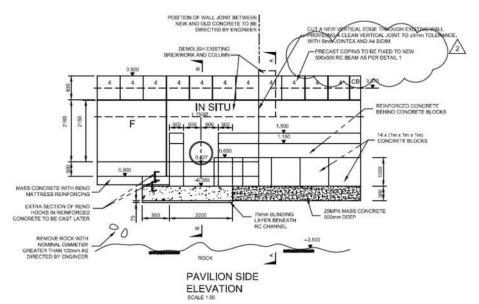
Pavilion Side Elevation of the seawall at Bart's Corner (MMD, 2013).
